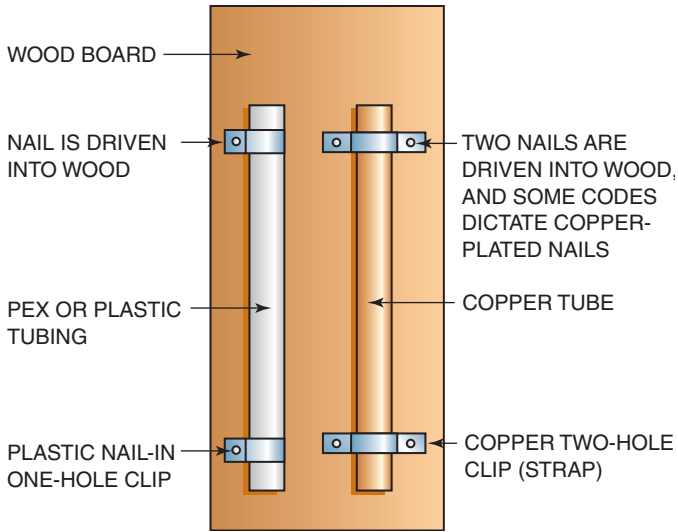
Clips and straps support lightweight piping to wood structures.
